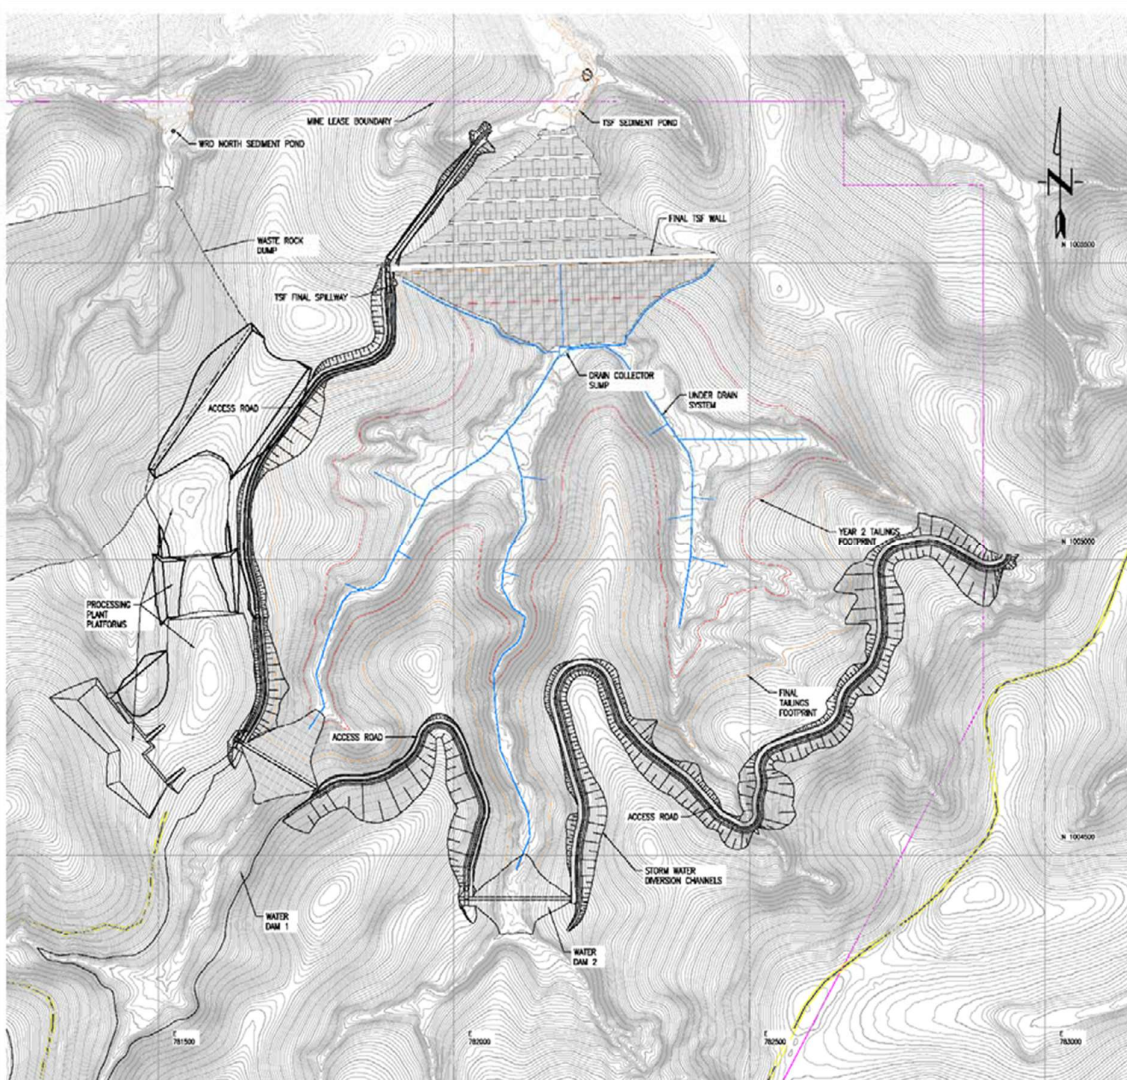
Proposed layout of TSF and water storage dams (Knight Piésold, 2020a)
